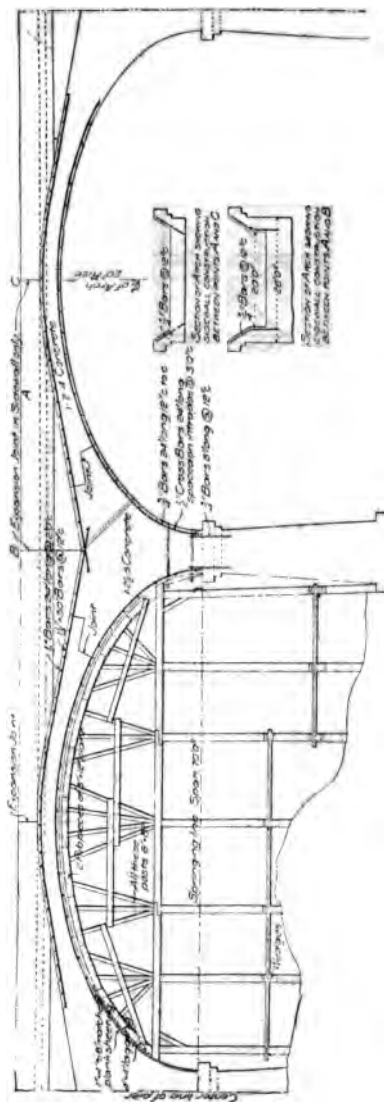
CENTER FOR SAN LEANDRO CONCRETE ARCH BRIDGE.
